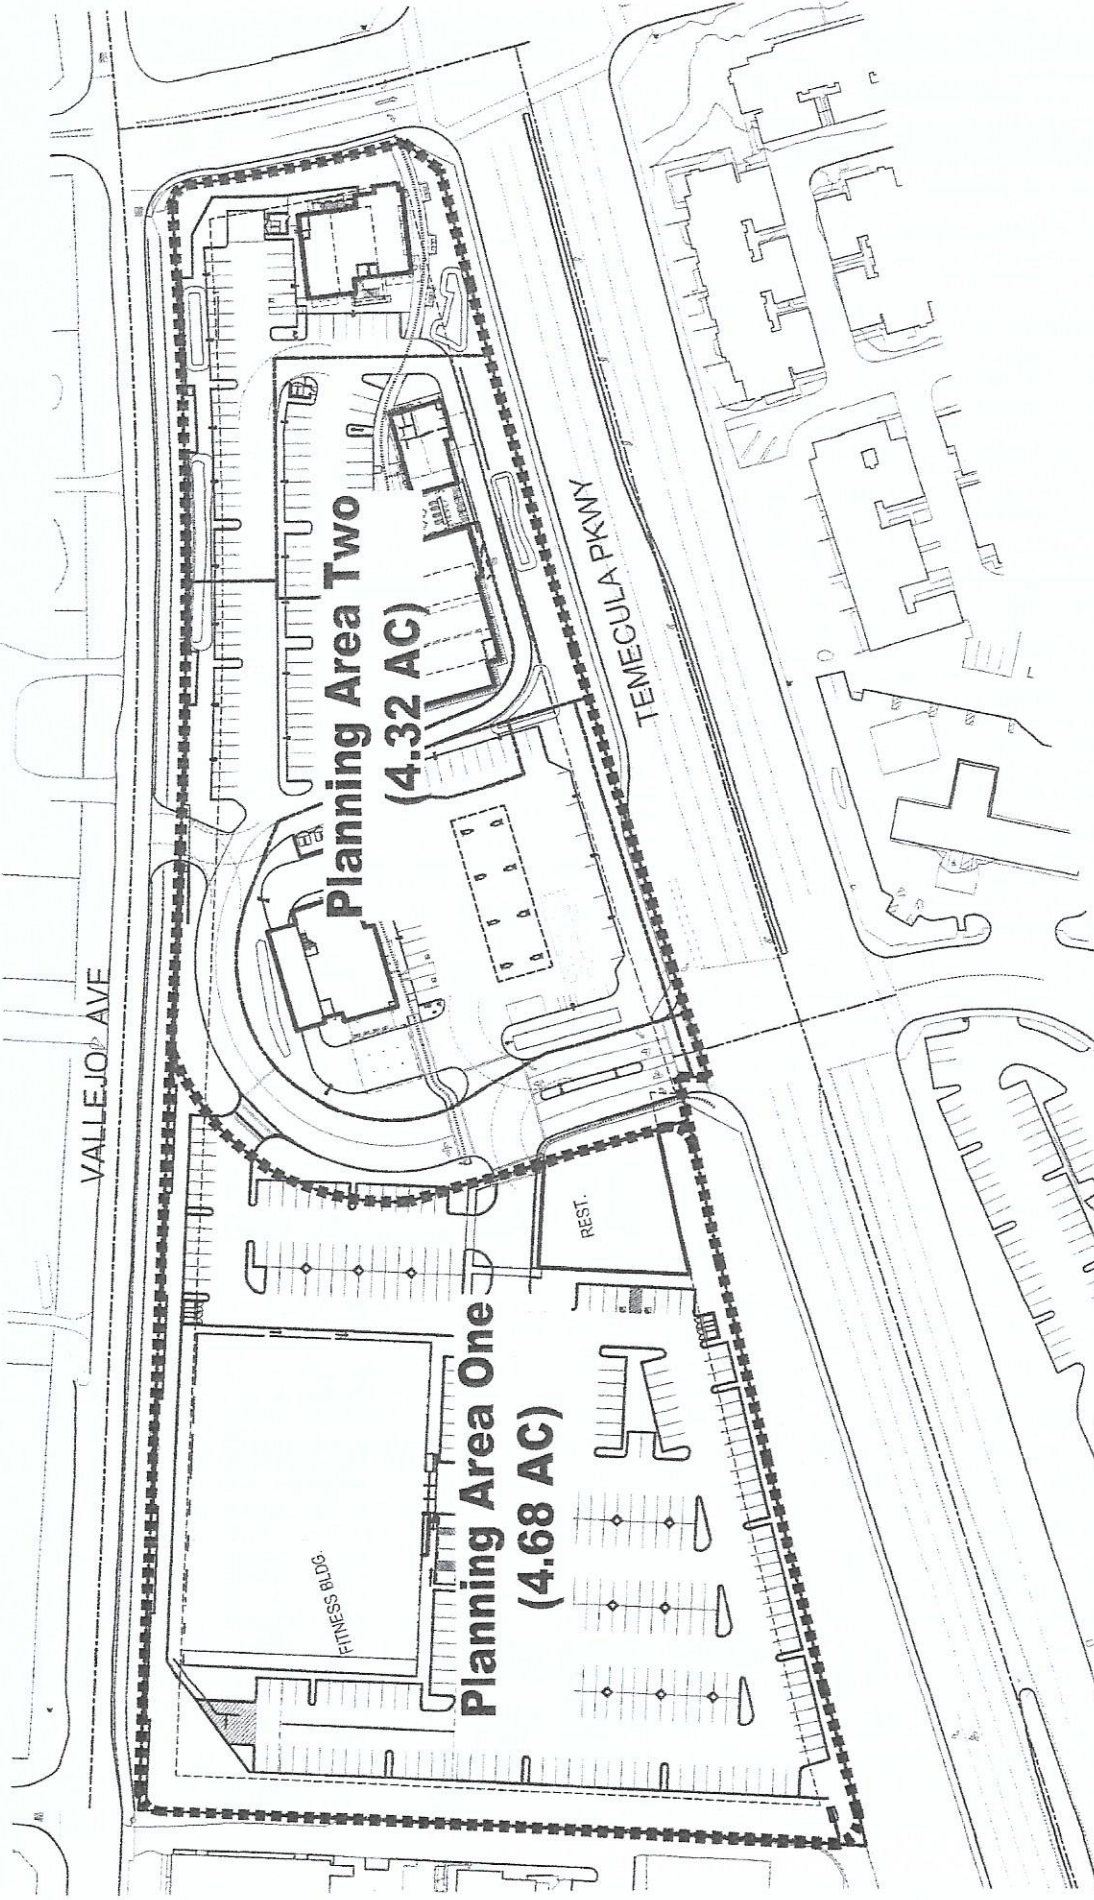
Exhibit E – Perimeter Wall/Bermings/Fencing layout
